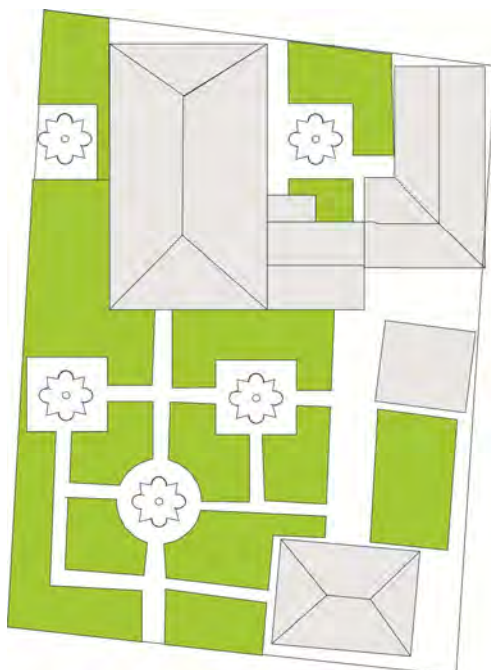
, Approximate Layout of the garden and fountains in the site and around the buildings (Author, 2011)
